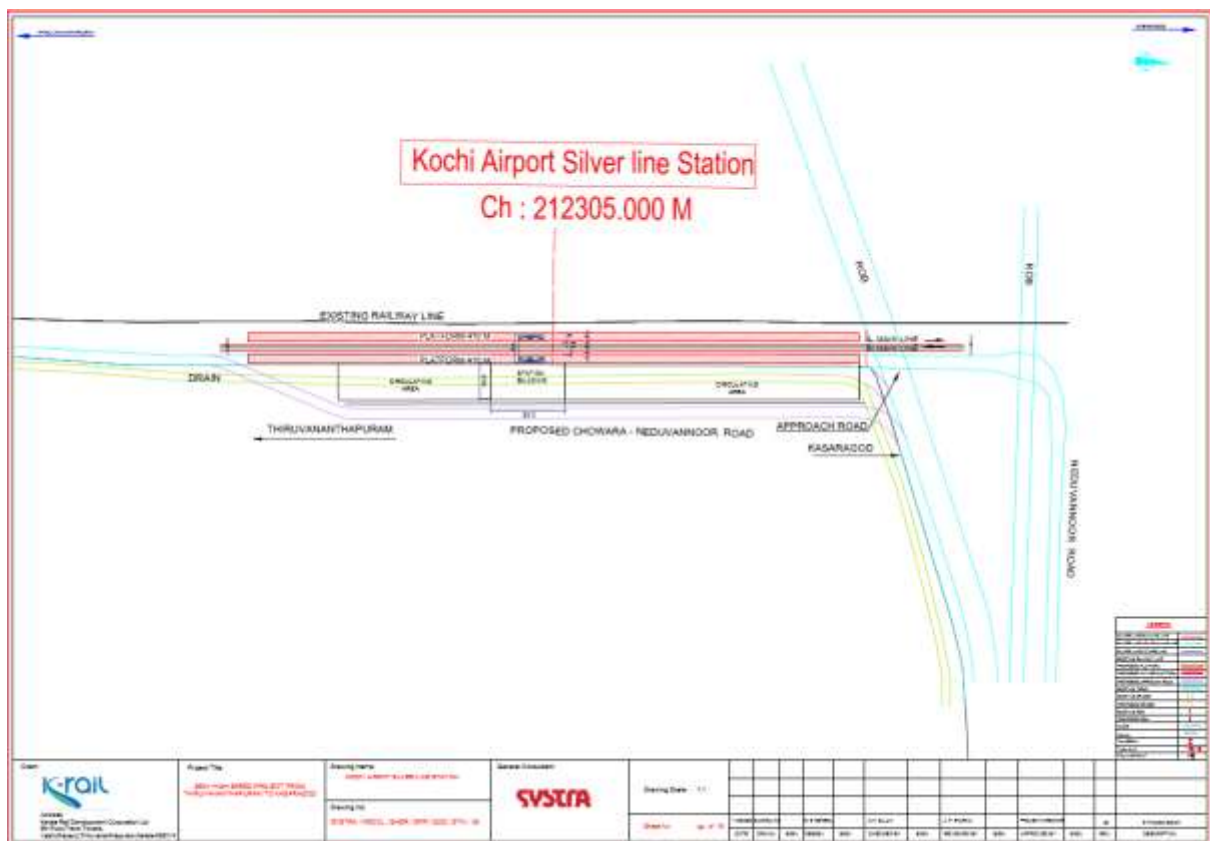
Kochi Airport SilverLine Station Layout Plan
